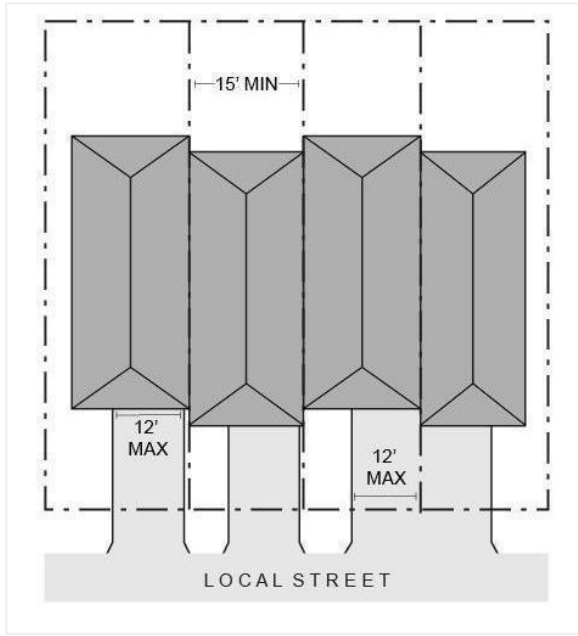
d. Townhouses with Parking in Front Yard
